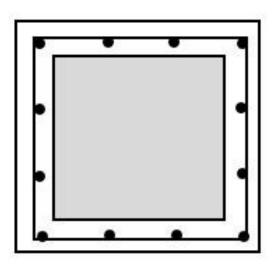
NEW EXTERNAL REBAR OR WWR
